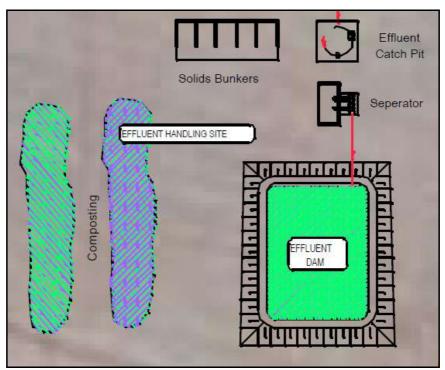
Alternative 2B - effluent handling site layout (designed by Dalein Plaasbou, 2017)
